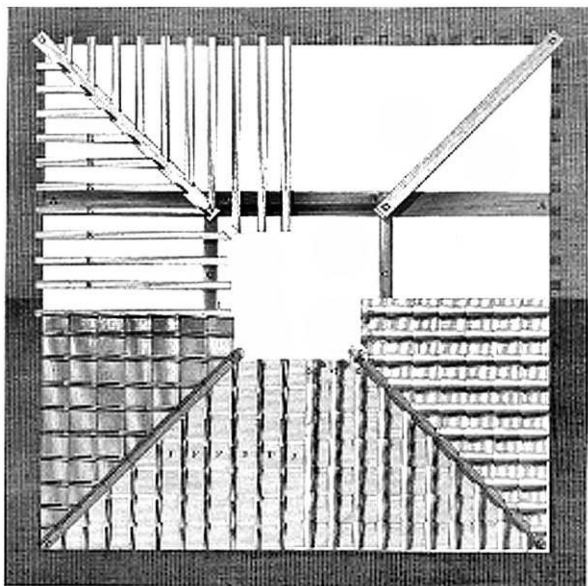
Typical roof structures of Pompeian villas, reinforced with steel or reinforced concrete in reconstructions. Sources: Mazois 1812, photo by author
